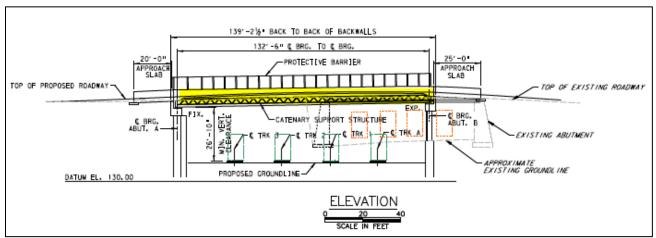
The proposed new bridge carrying Edmondson Avenue over the historic rail line.
